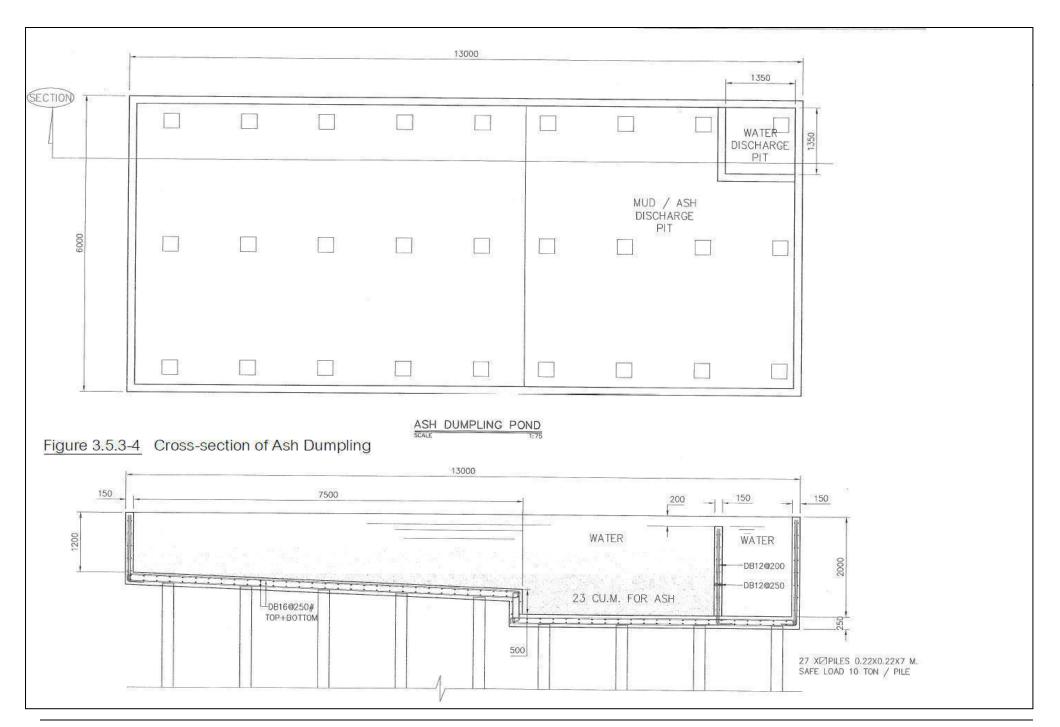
Cross-section of Ash Dumpling Pond
